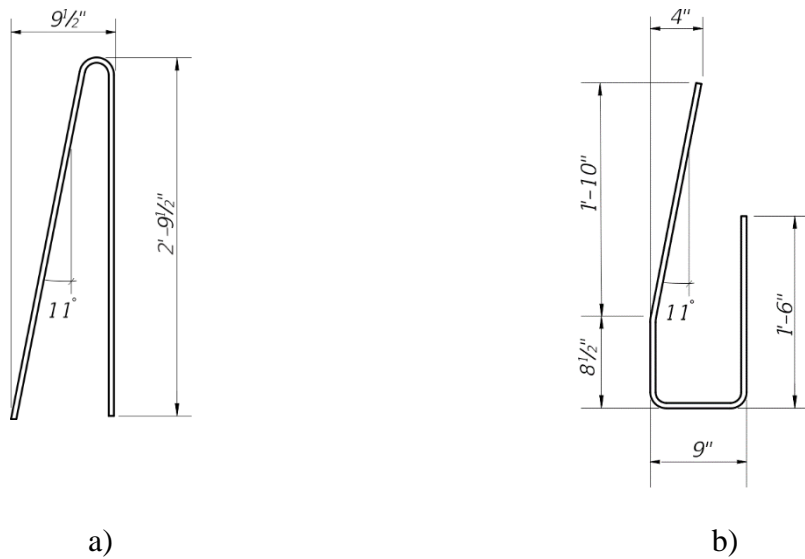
Steel bars for steel-reinforced bridge rail: a) bar 4P; b) bar 4V
